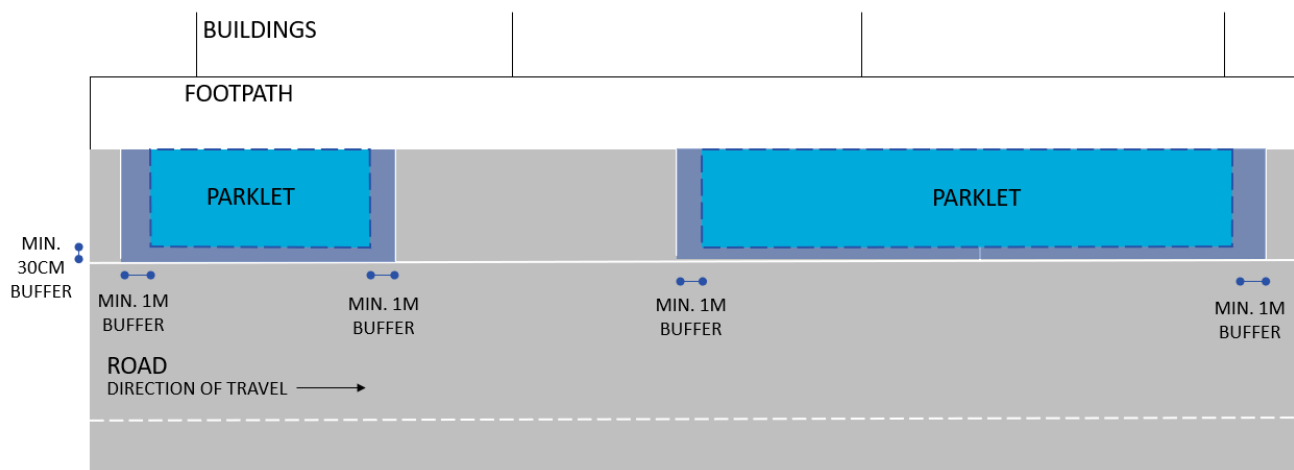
EDGE BUFFER FOR PARALLEL PARKING SPACES
